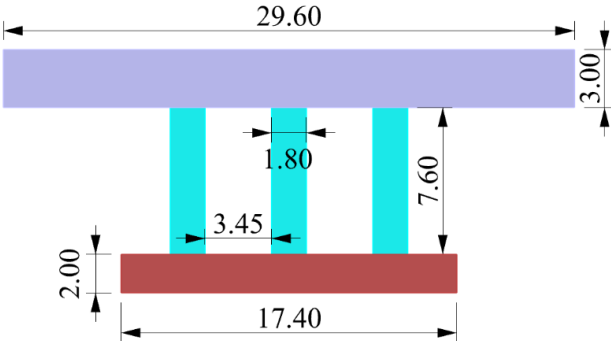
Dimensional detail of specimen B2 (unit: m)
